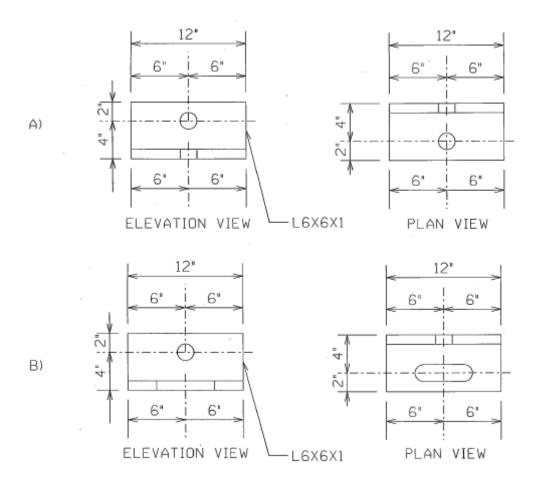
Little Bear Creek Abutment Connection (Expansion)
